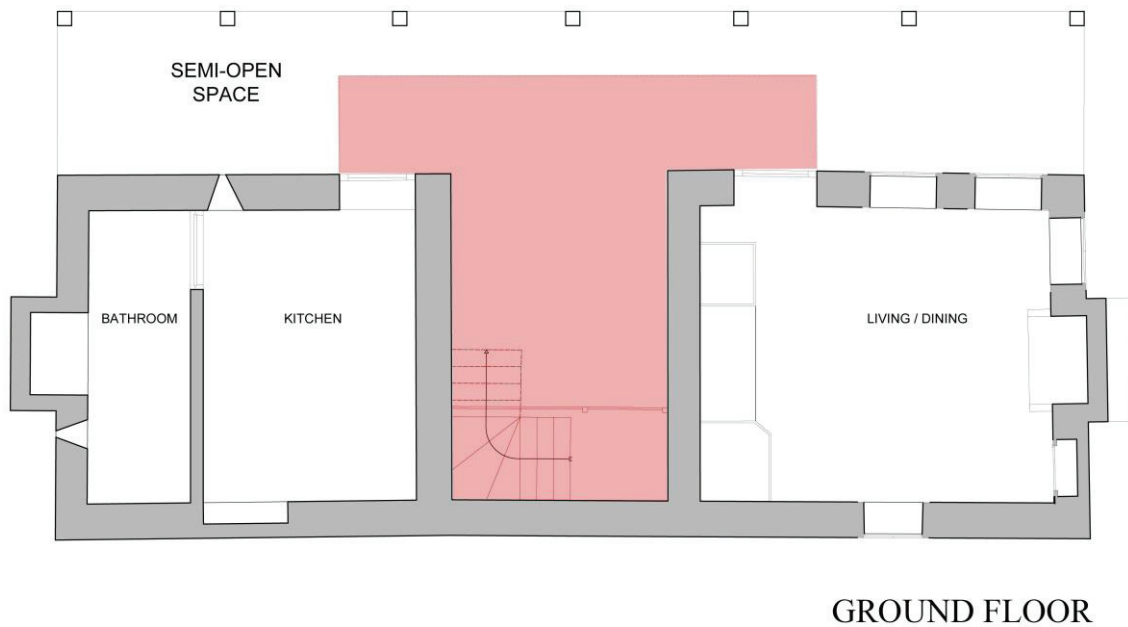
Sönmezer House ground floor plan indicating glazed circulation proposal in red hatch
